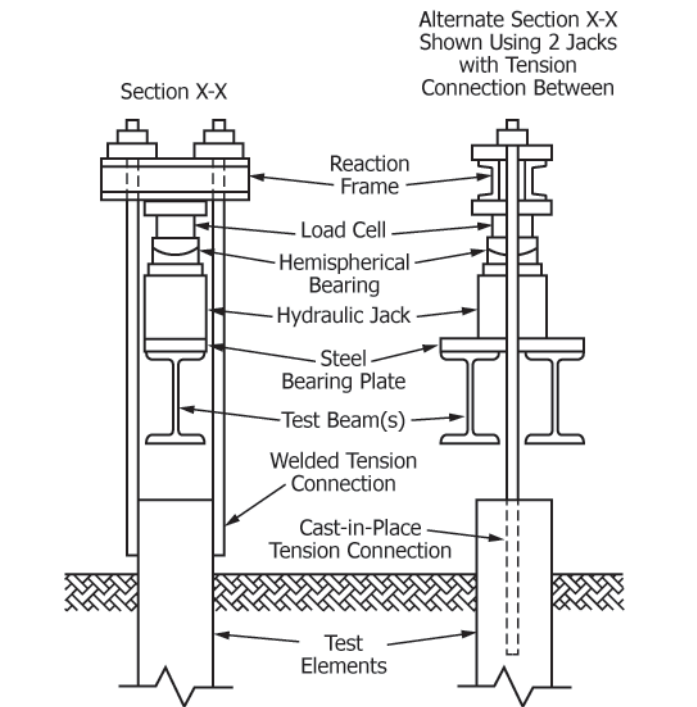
Typical Section X-X (Fig. 2) of Test Beam(s) at Test Element(s)
